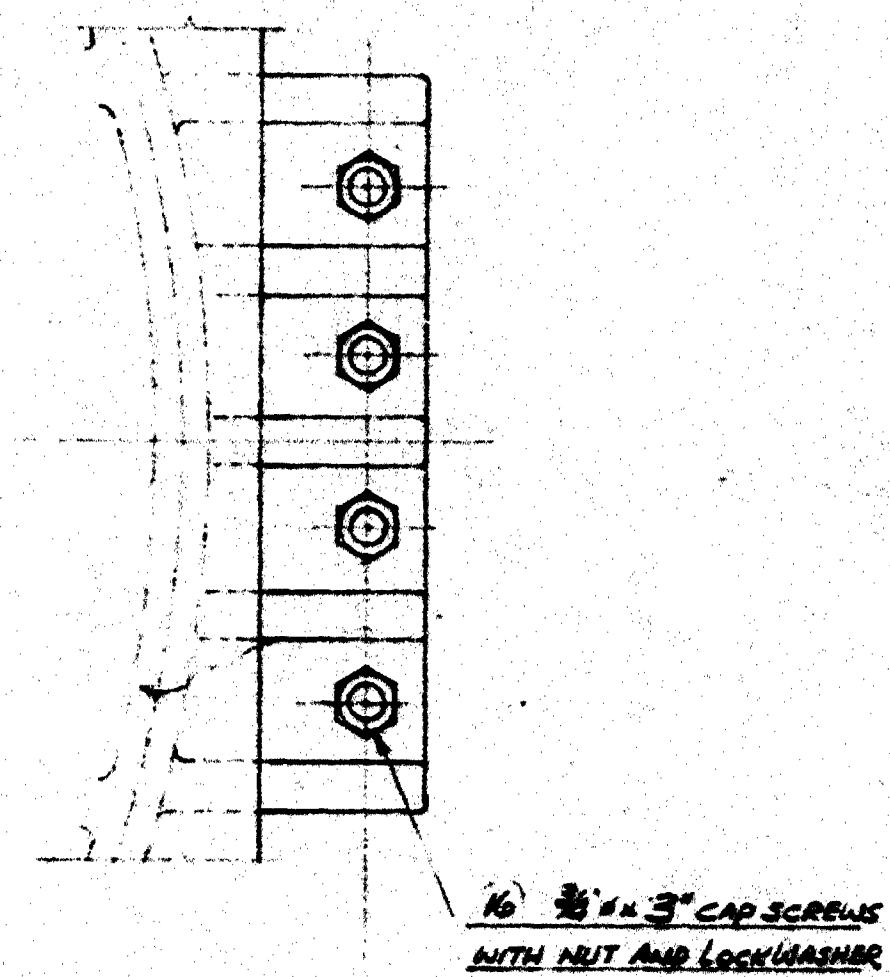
DETAIL OF INFLUENT PIT AND CENTRE PIER ANCHORS.
